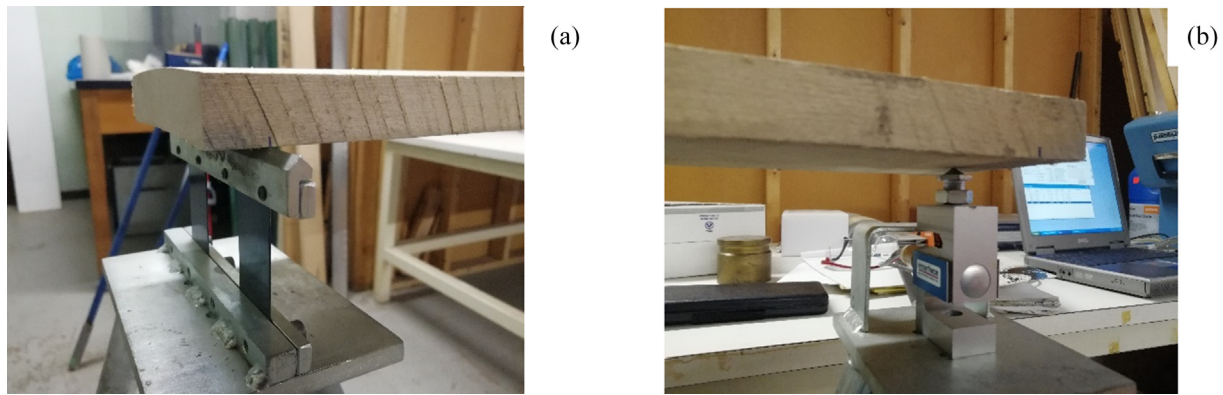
Test setup for conducting transverse vibration test. (a) flexible edge support (b) point support through a load cell.
